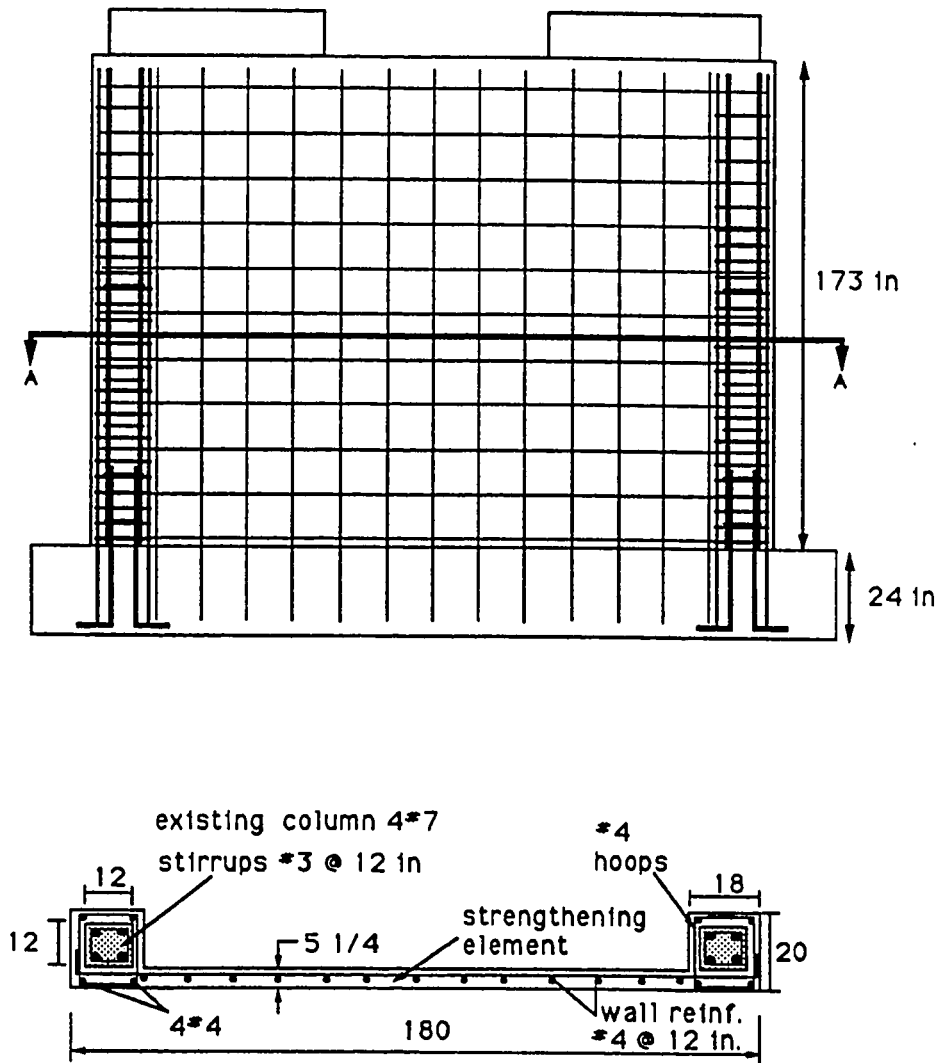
Seismic Strengthening by the Addition of Infill Walls,
